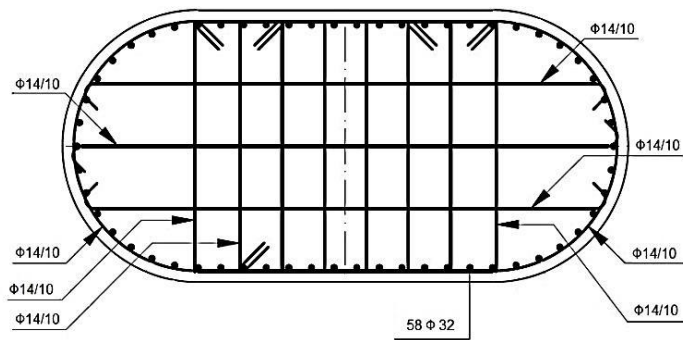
Reinforcement Scheme for the Piers of Panayır Bridge
